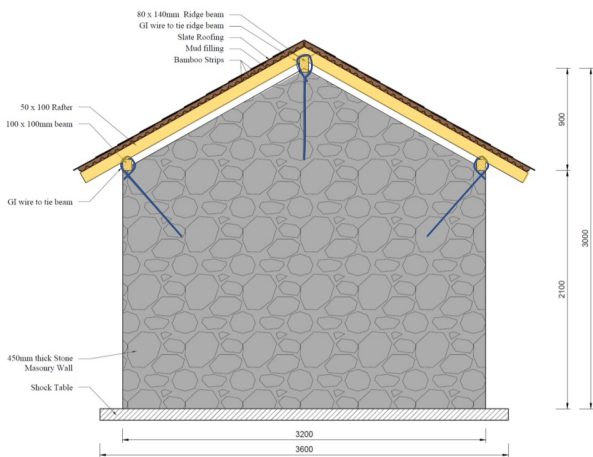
Building mock-up wall and roof details (note: dimensions are in mm)
